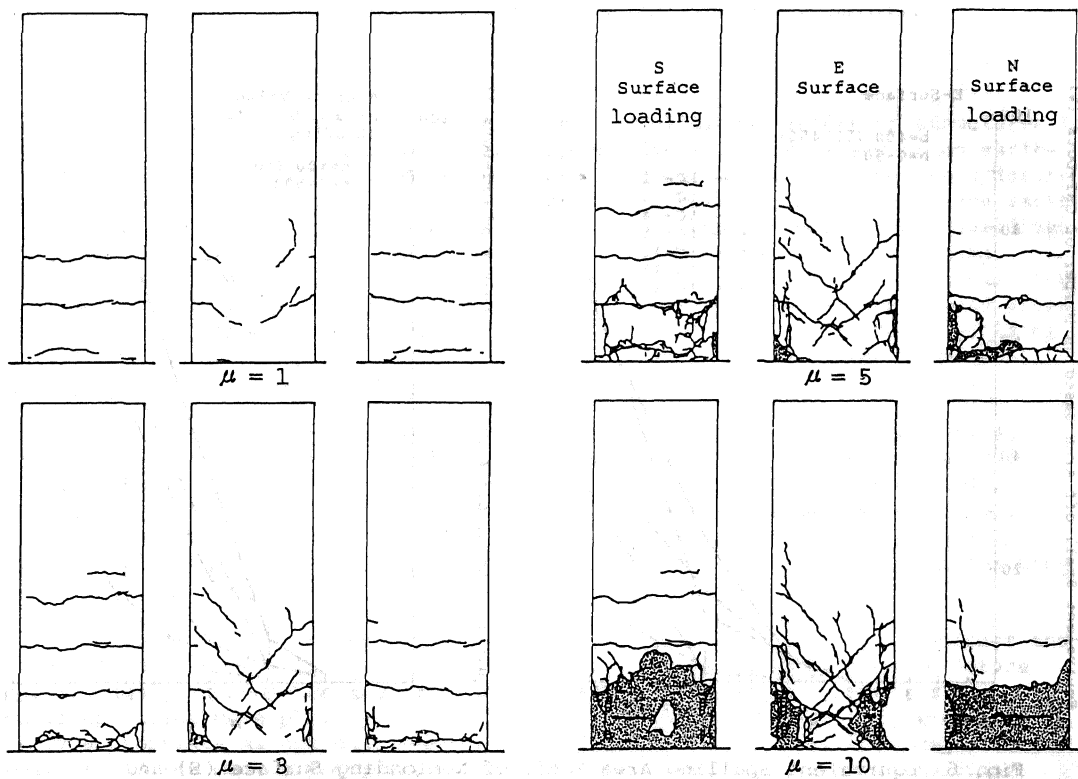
Crack and Spalling Diagrams of Specimen LC-12
